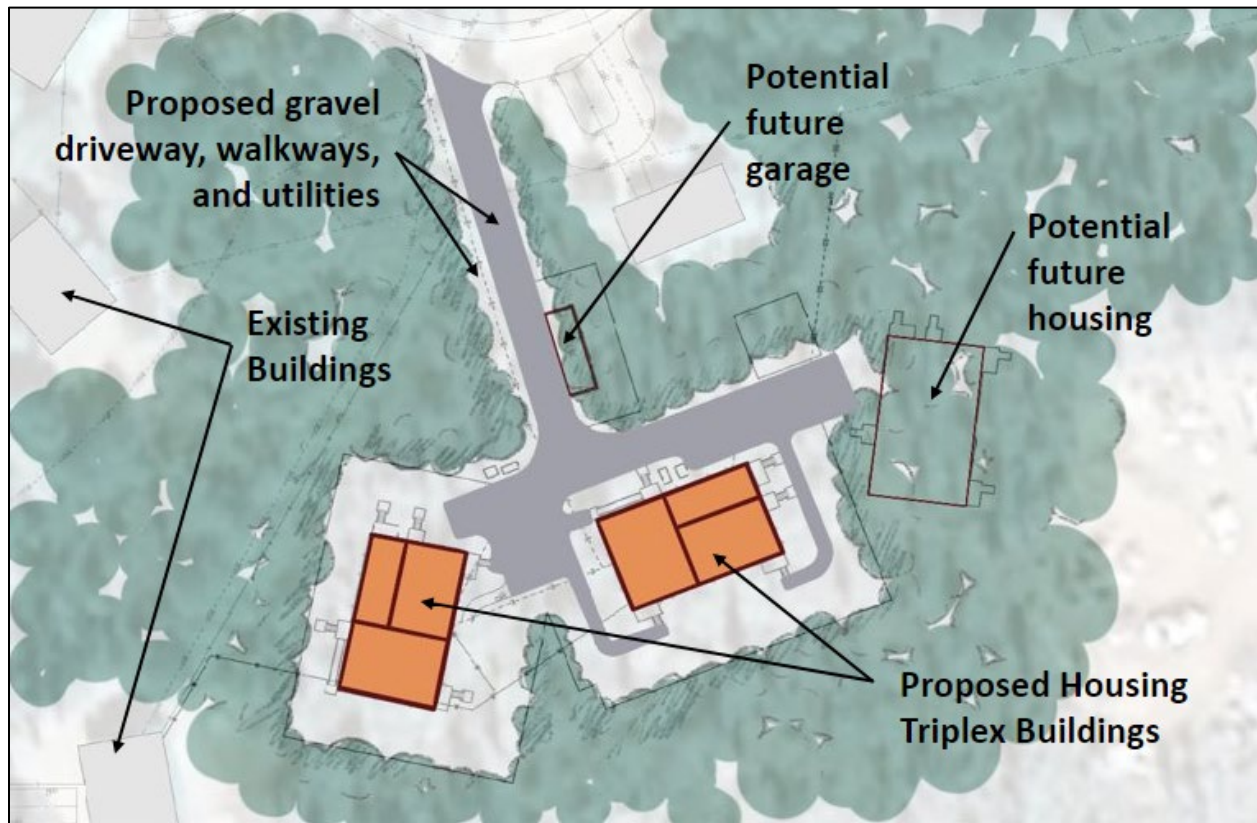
Proposed Schematic Design Plan for Port Alsworth Housing.
